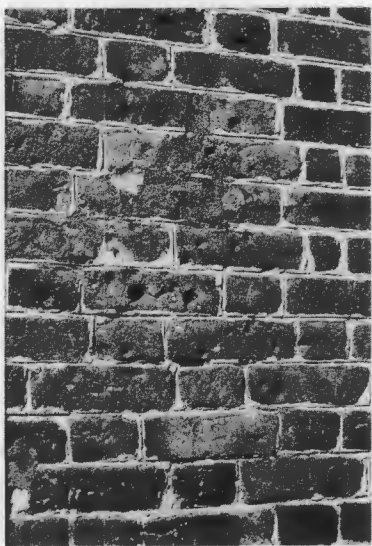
Mortar joints of 18th century brick buildings were often as much as 1/2 inch wide, cut flush and struck with a grapevine joint, but for window and door surrounds where a finer quality rubbed brick was used, mortar joints were very thin. Photo: National Park Service Files.
